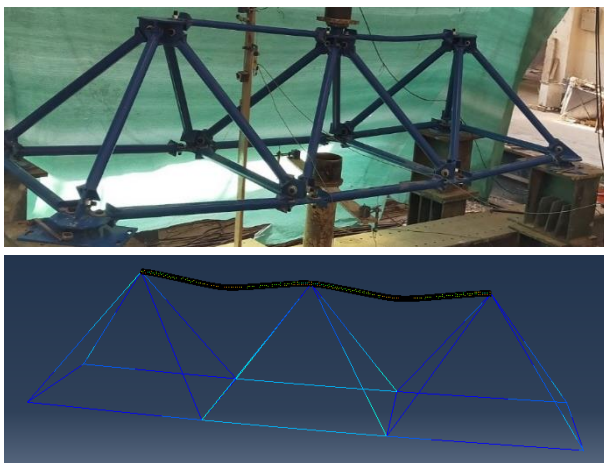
F.E. Modelling and Experimental Deformed Shape of Steel Space Truss CT1.
